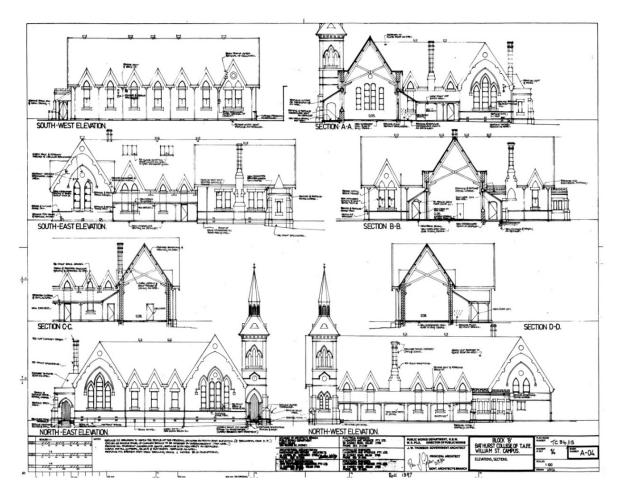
Part 4: The 1986 measured drawing ELEVATION & SECTION of the former Public School building. Many small alterations and repairs were carried out at that time. For example post brackets were replaced, the slate roof repaired, stone trims replaced and some repointing to brickwork and stone.
